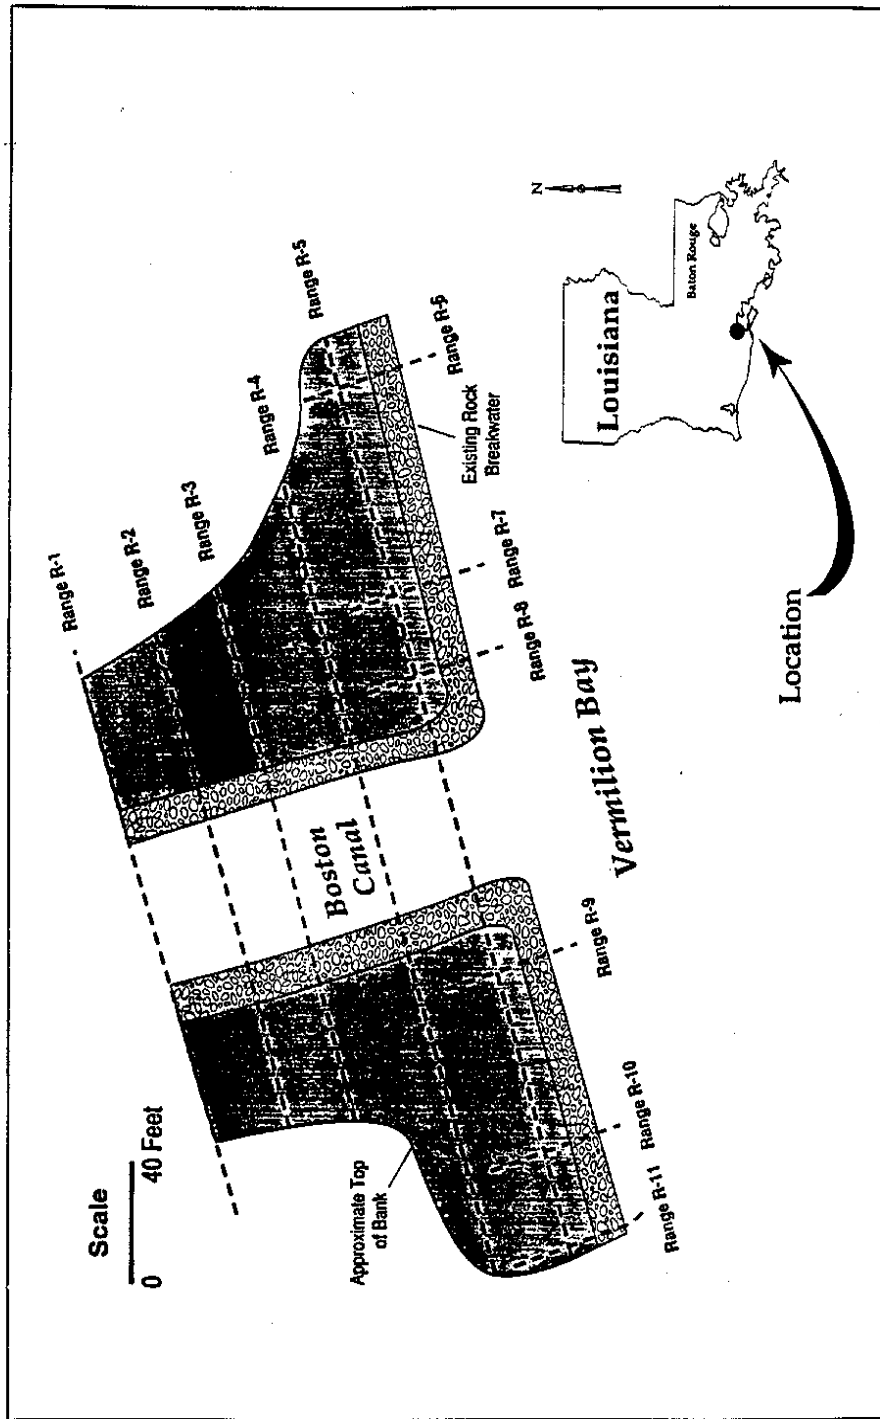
Boston Canal/Vermilion Bay Shoreline Protection (TV-09) cross section of the mouth of Boston Canal labeling elevational transects.
